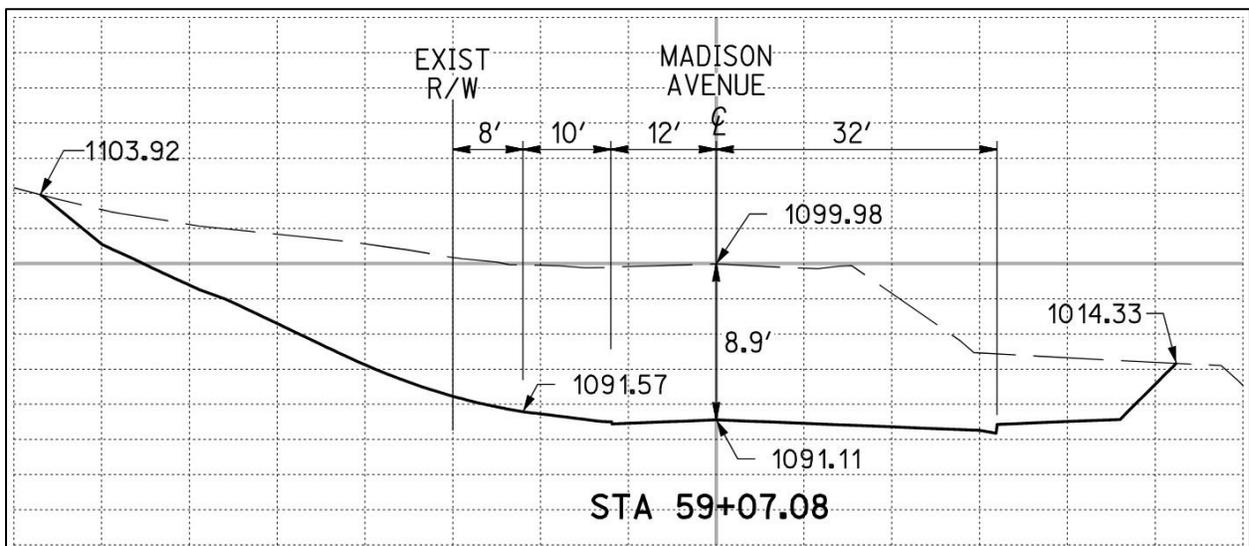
Cross-Section in Location of Maximum Cut Slope
